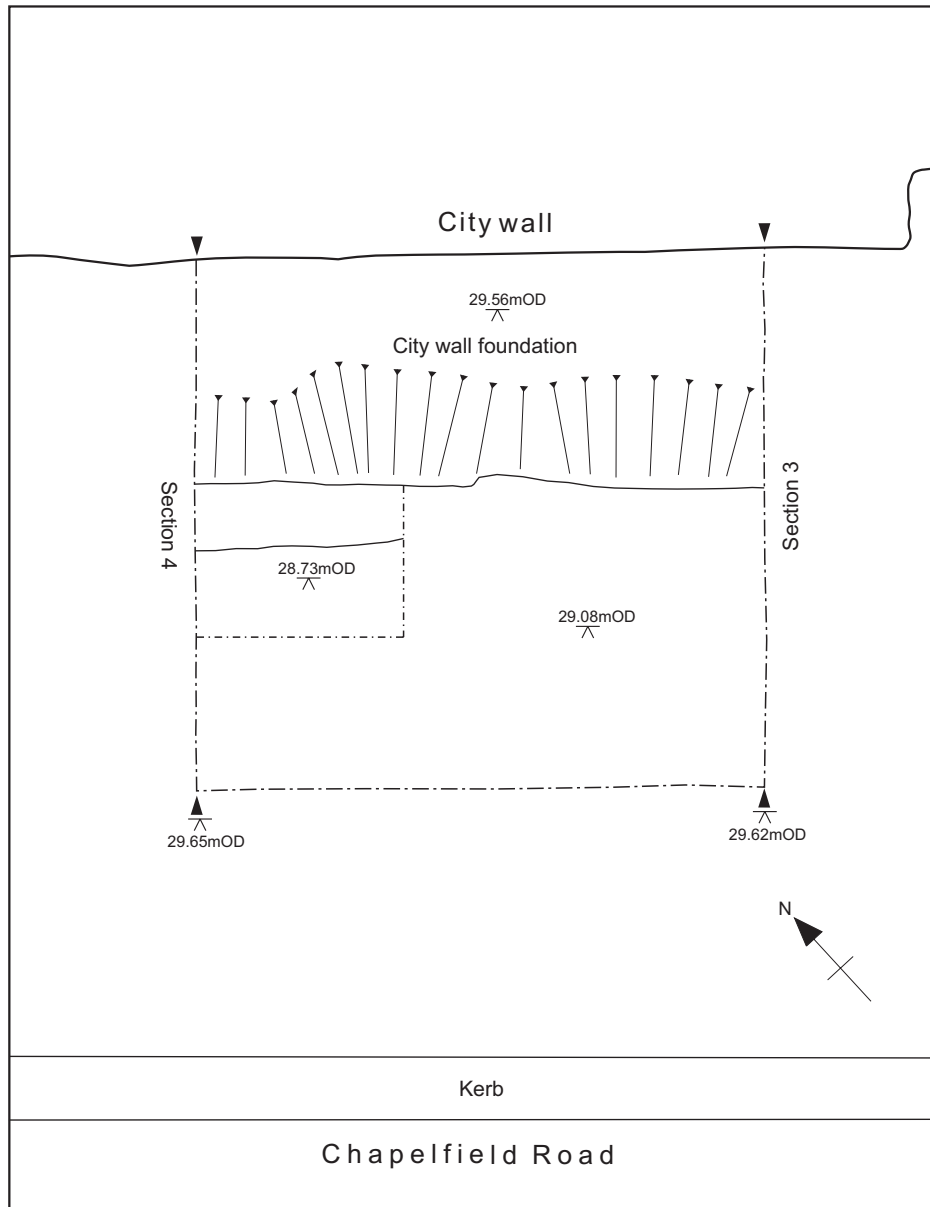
Plan of Test Pit 4 and sections 3 and 4. Scale 1:20
